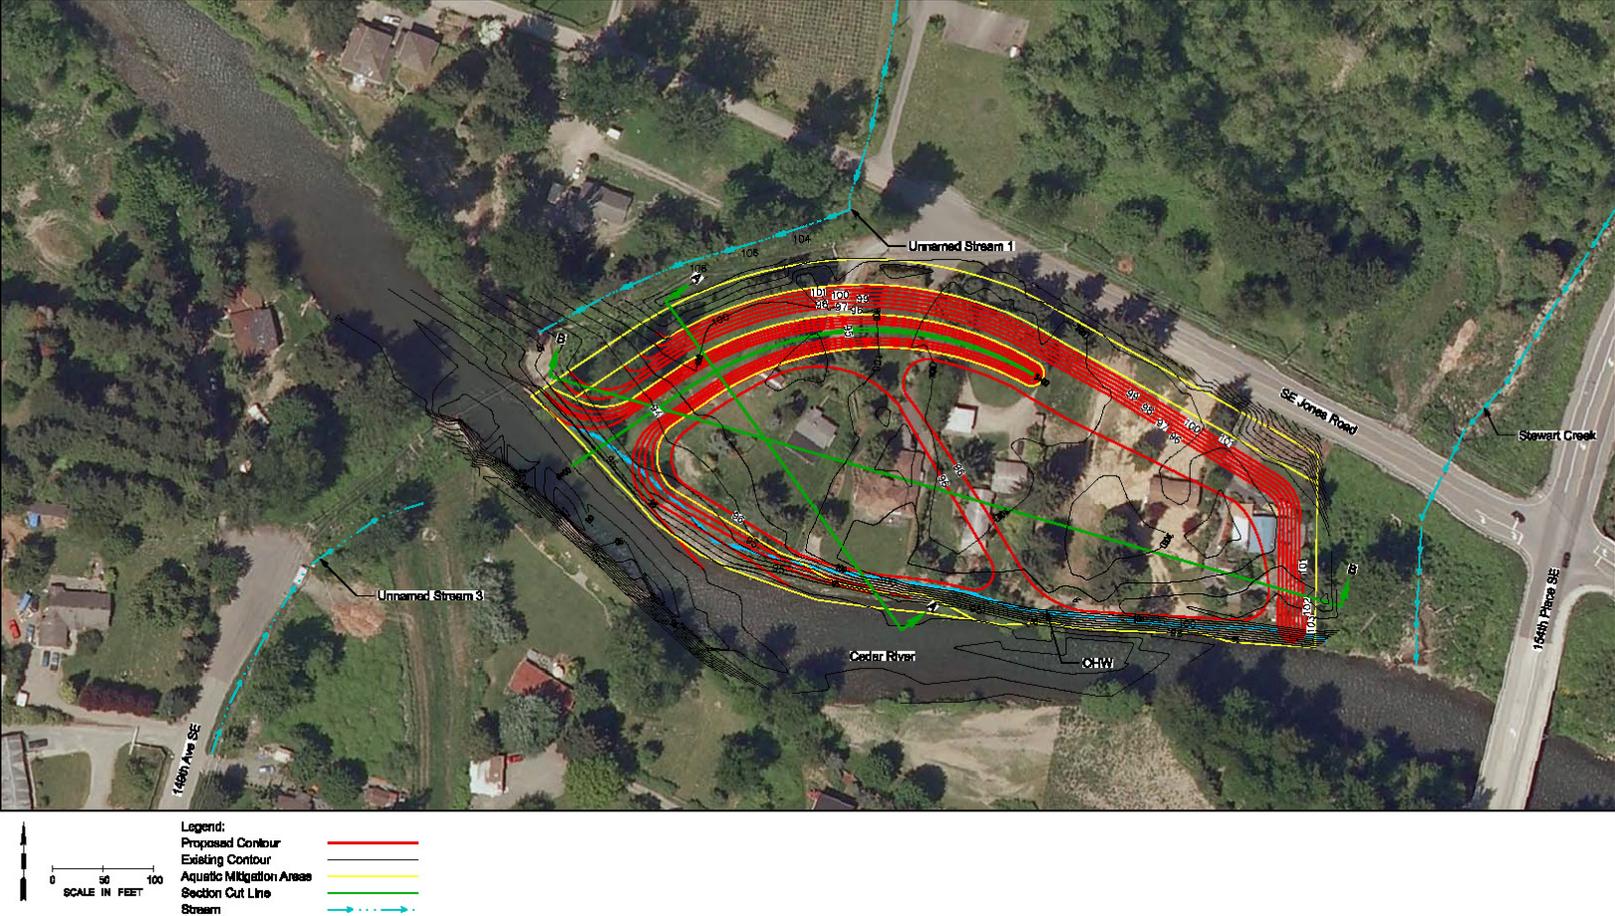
Cedar River/ Elliott Bridge Site Grading Plan
